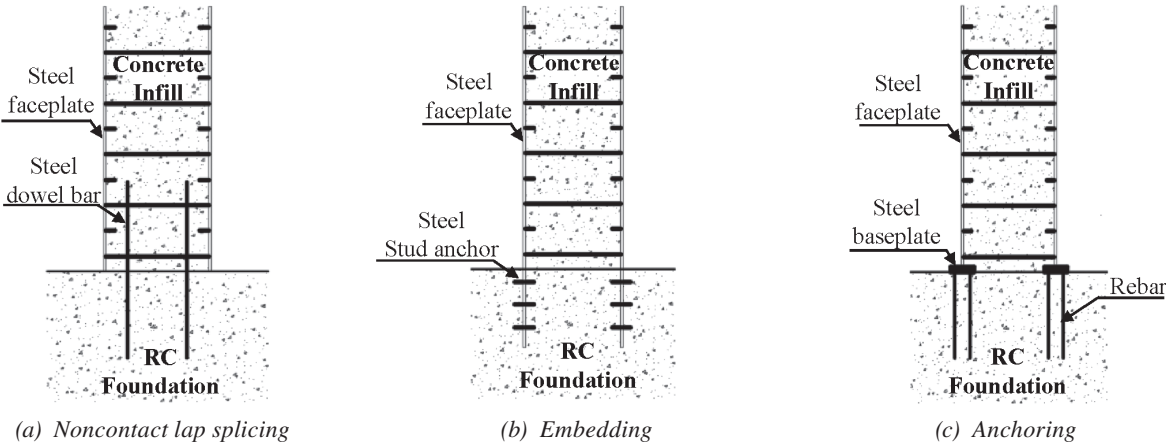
Connection techniques for SC wall-to-RC foundation (Seo and Varma, 2017a).
